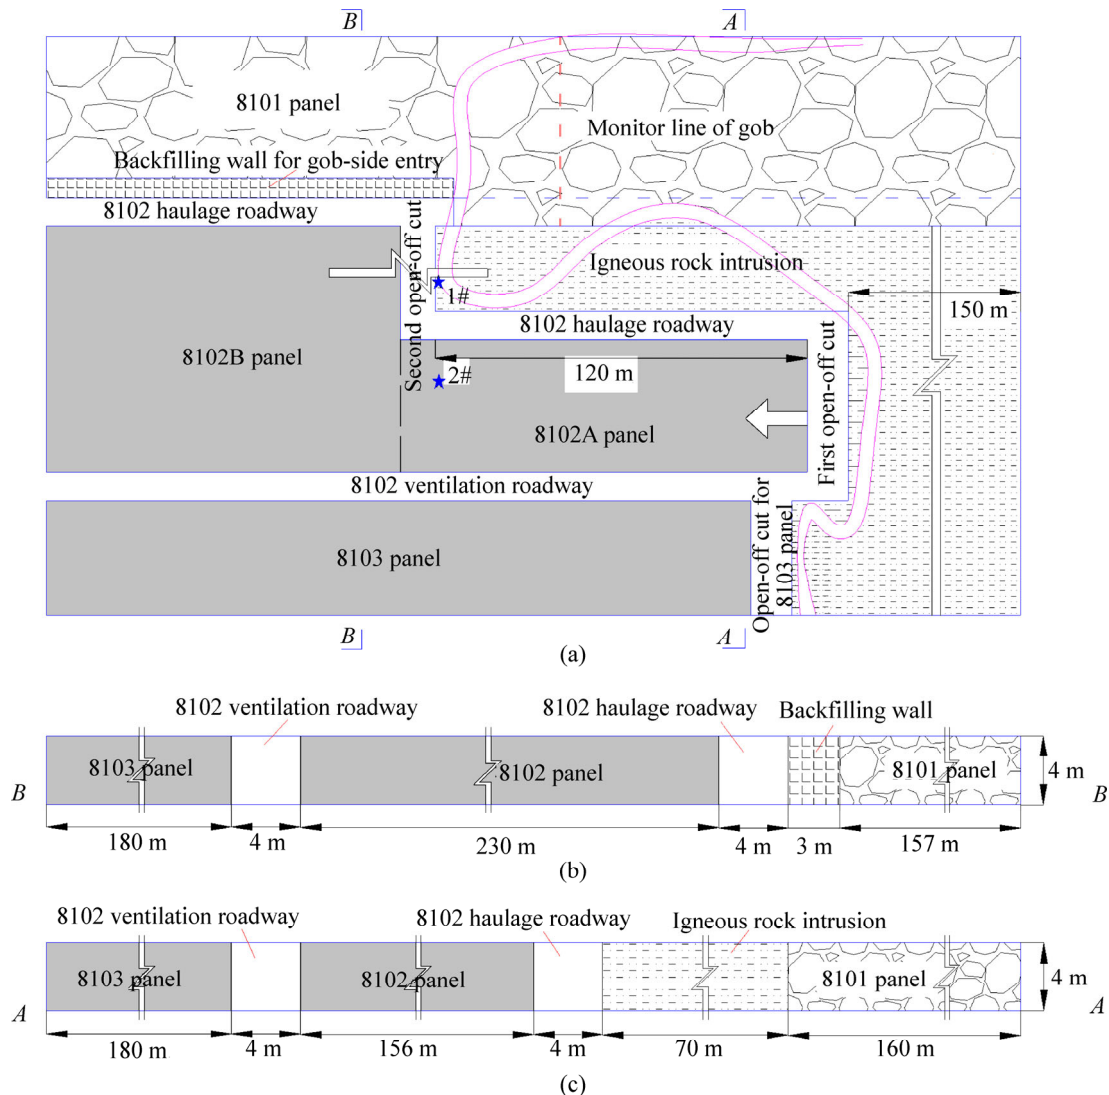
Lay-out of panels in 8# coal seam and intrusion areas of igneous rock: (a) Floor plane of panels and roadways; (b) Sectional plane of A-A; (c) Sectional plane of B-B
